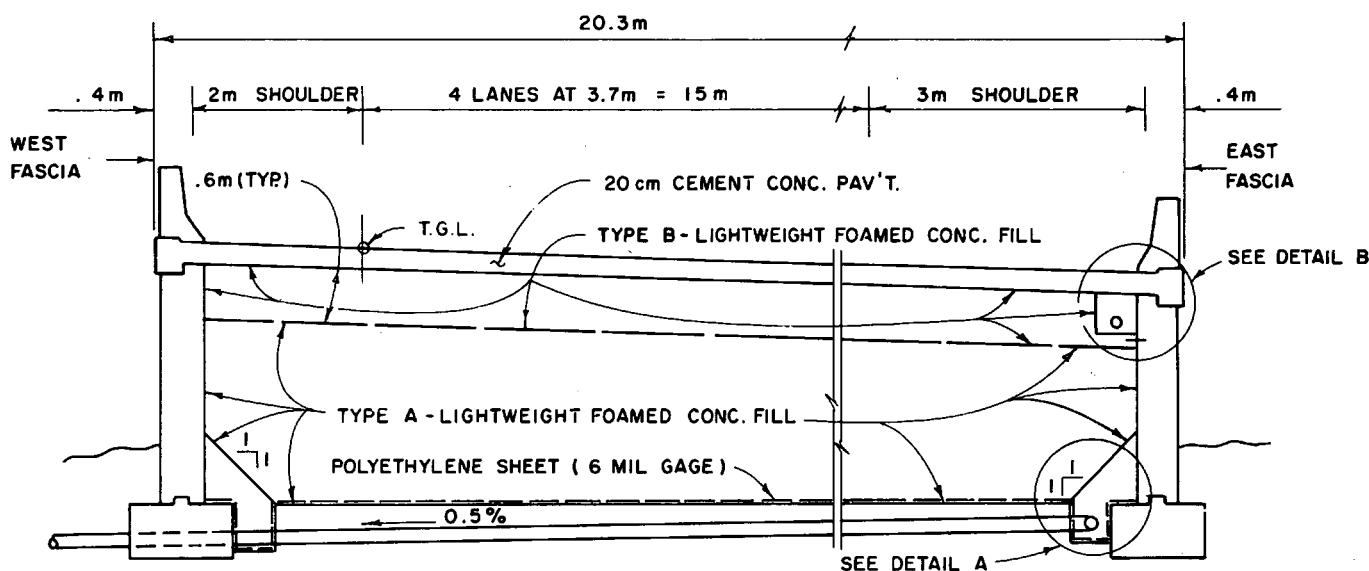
LFCF, underdrains, polyethylene sheeting, and waterstop (1). Details A and B are enlarged in Figure 13.
